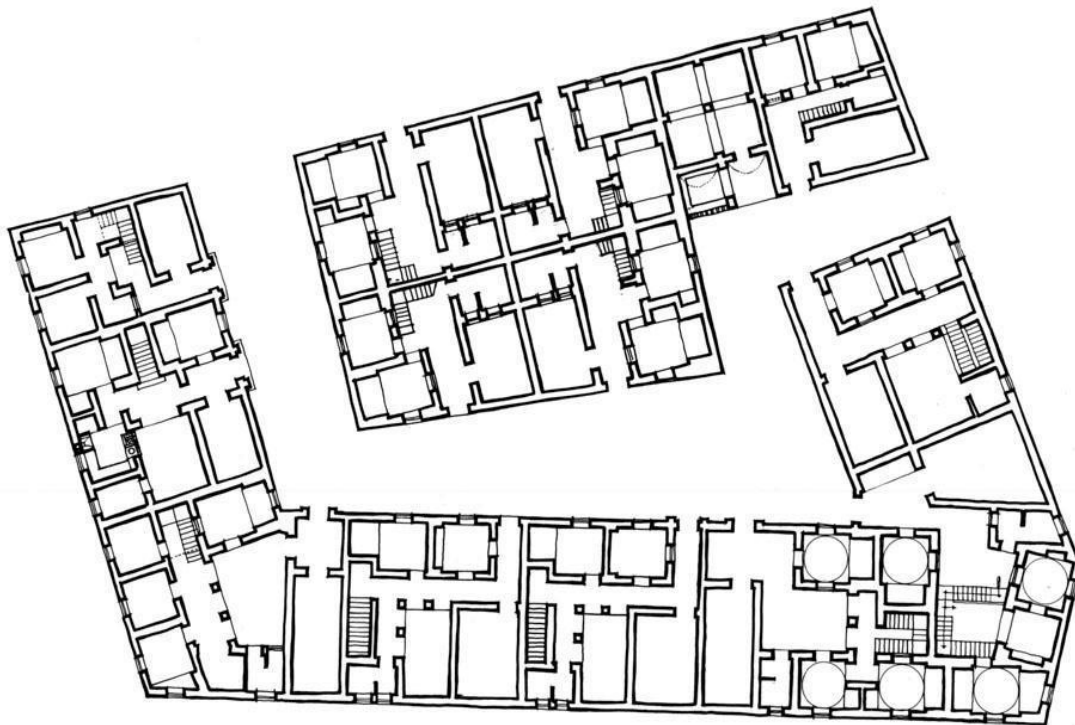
New Gournia-Neighbourhood no. 6: design drawing, plan
